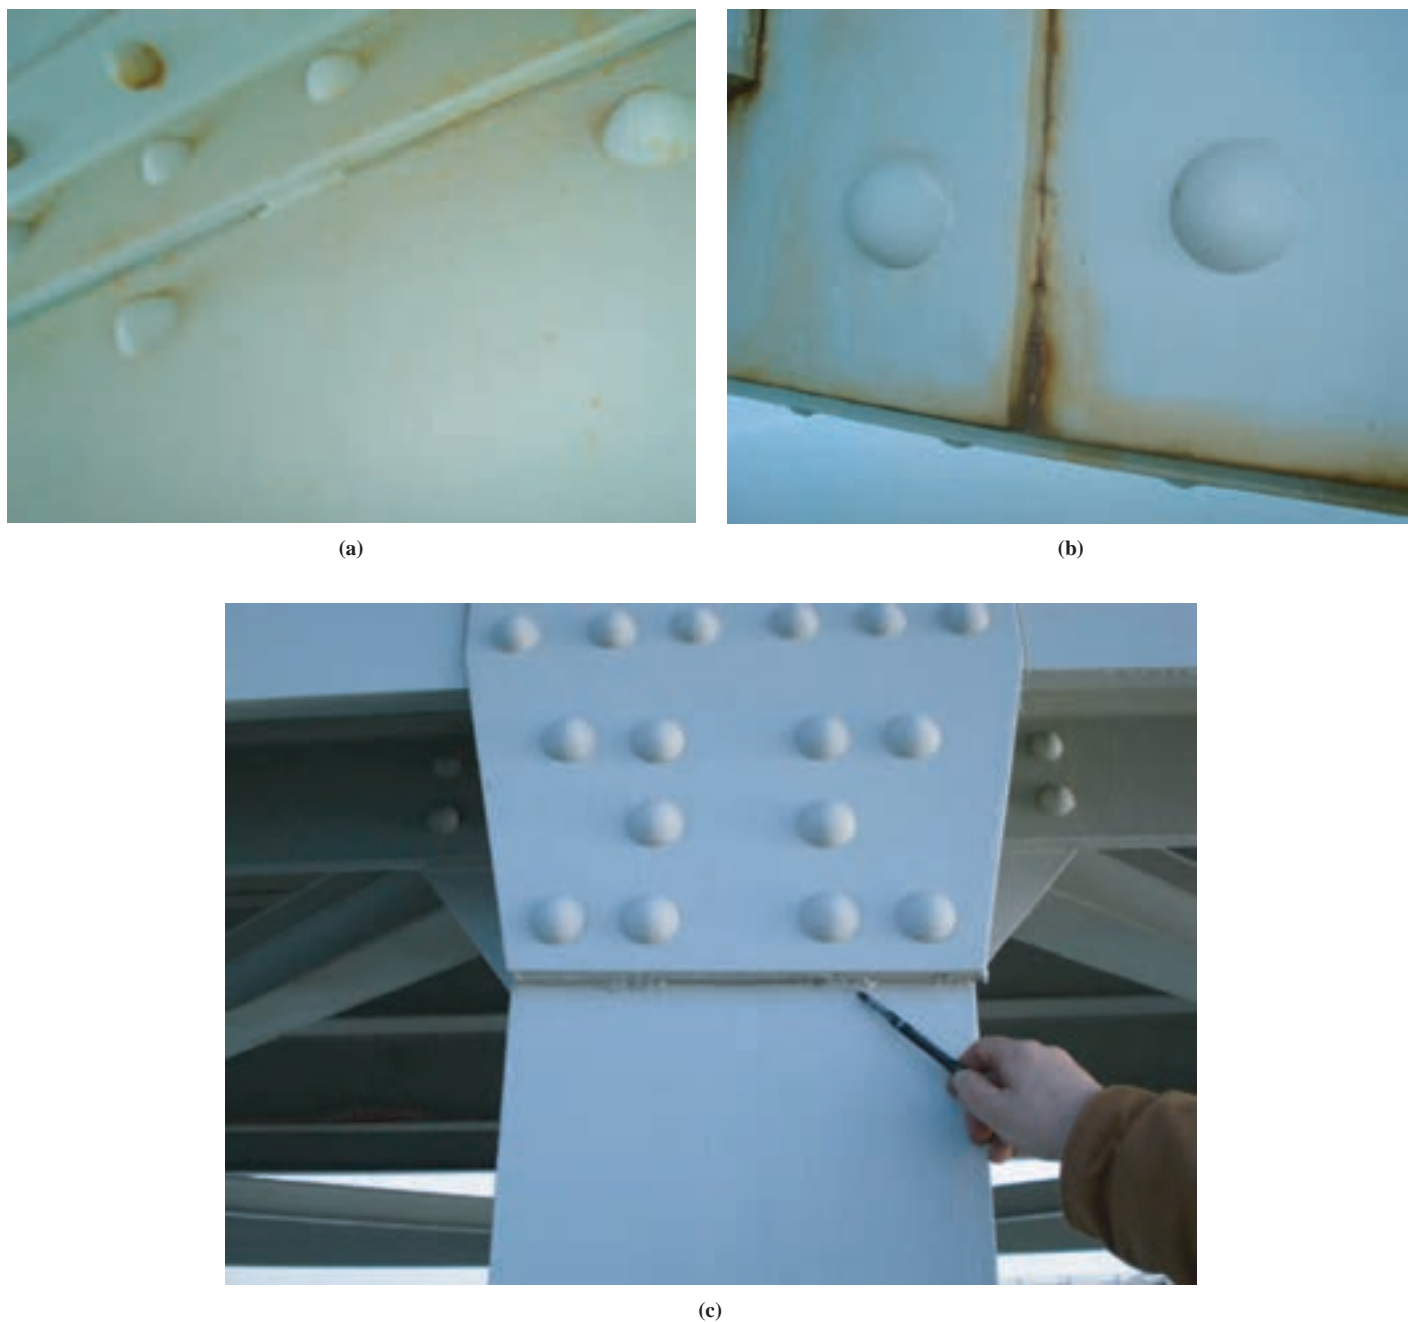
Examples of tack welds used in bridge structures: (a) tack weld left in place after riveting, (b) tack weld throat crack, and (c) transverse tack weld.
